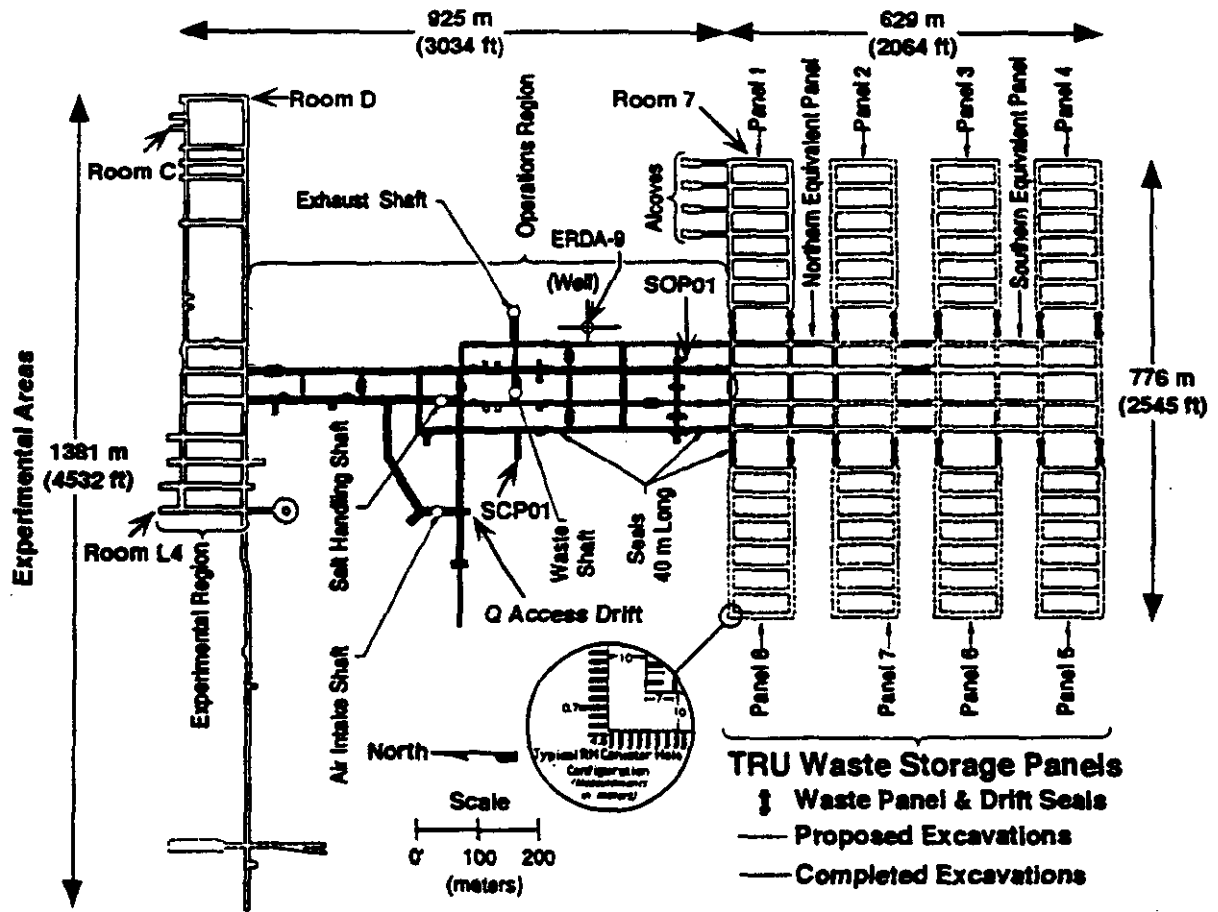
Plan View of WIPP Completed and Proposed Excavations.
